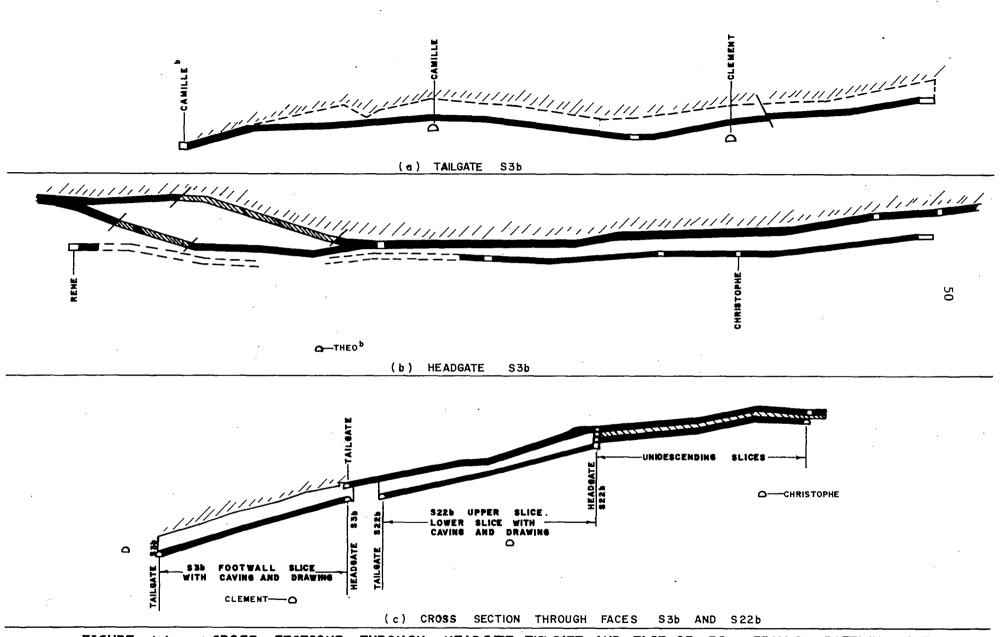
CROSS SECTIONS THROUGH HEADGATE, TAILGATE AND FACE OF 53b, SEAM 2, ROZELAY MINE
